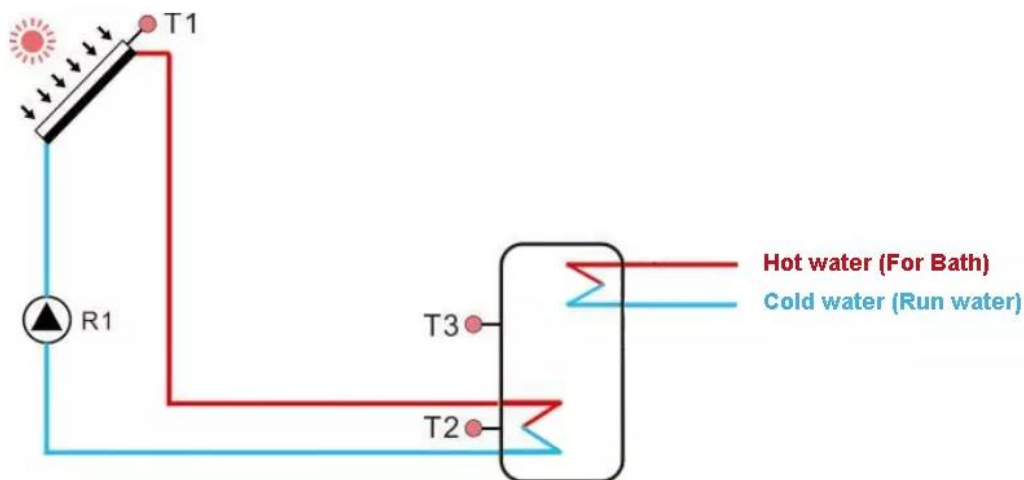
Design approach two: 1,000L-2,000L SWH system
